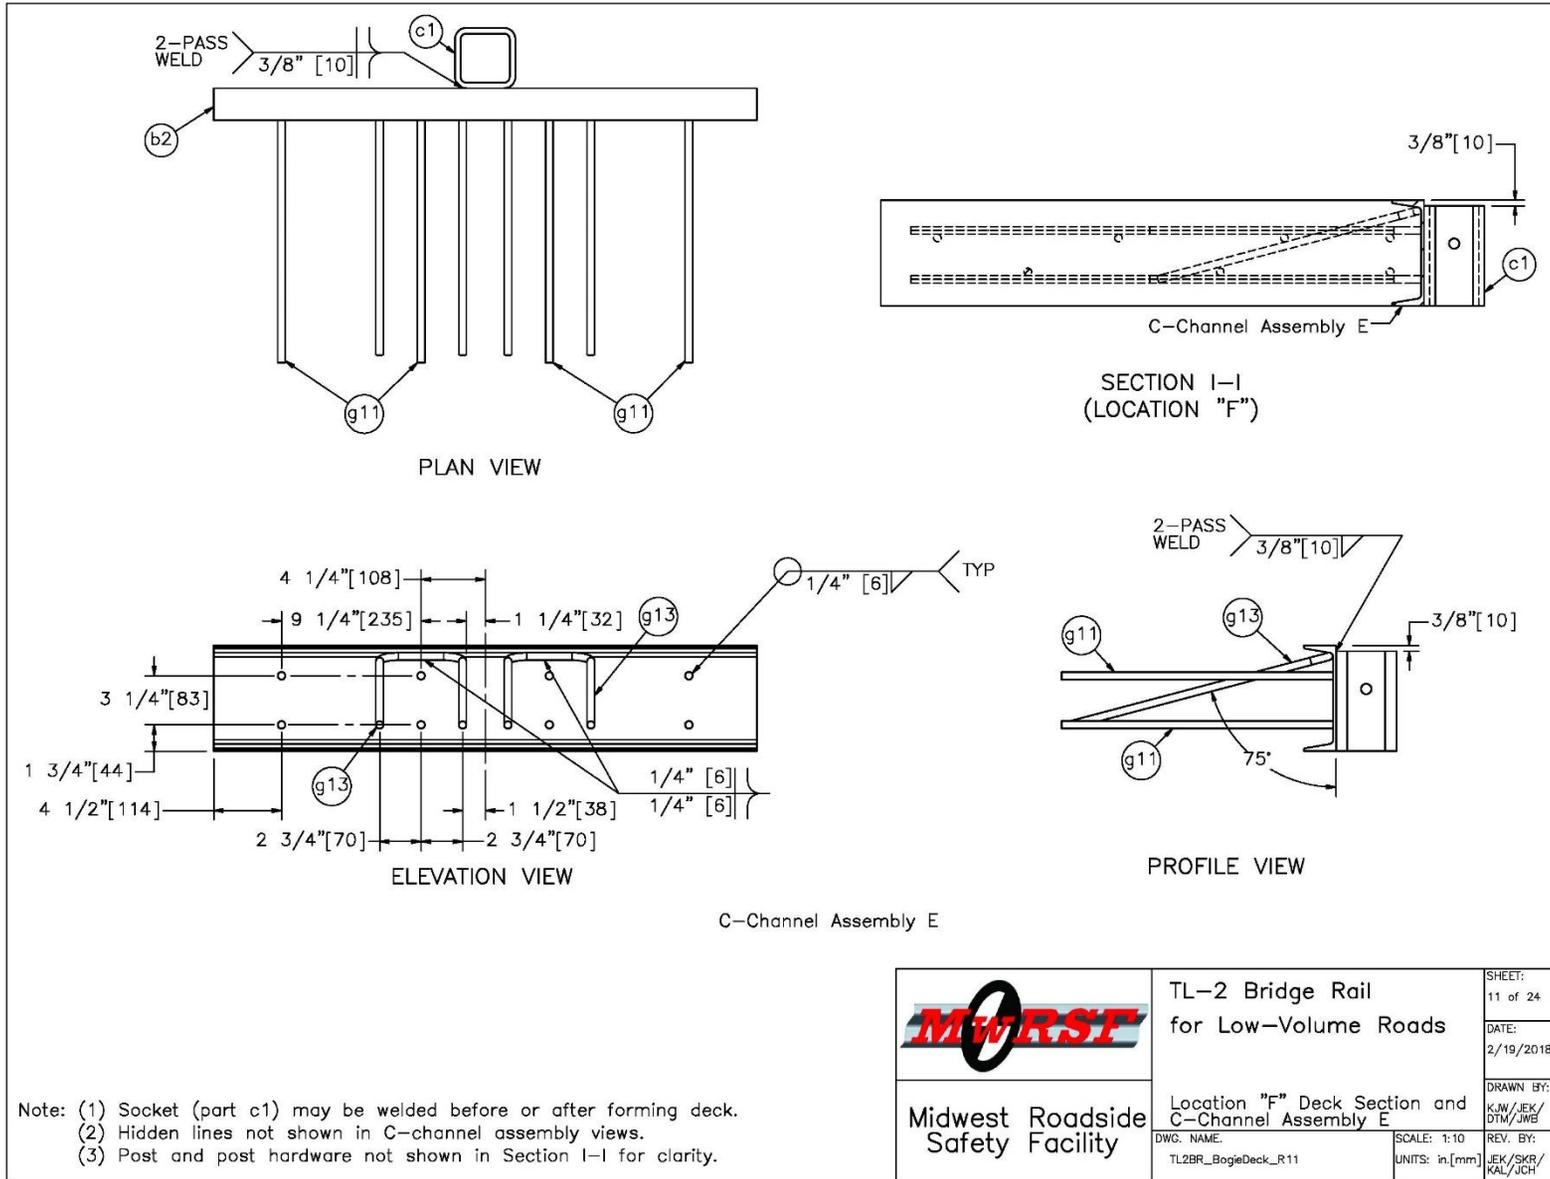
Bogie Testing Matrix and Setup, Location "F" Deck Section and C-Channel Assembly E
